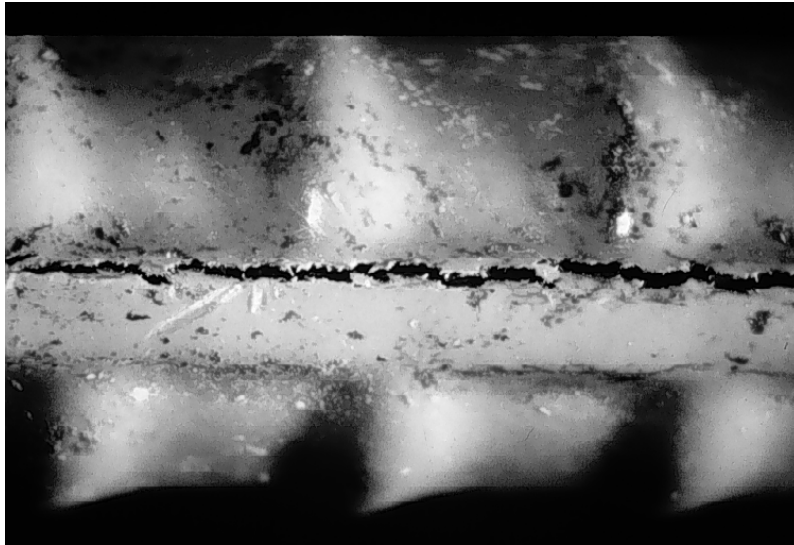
Cracking of coating along stirrup leg.
